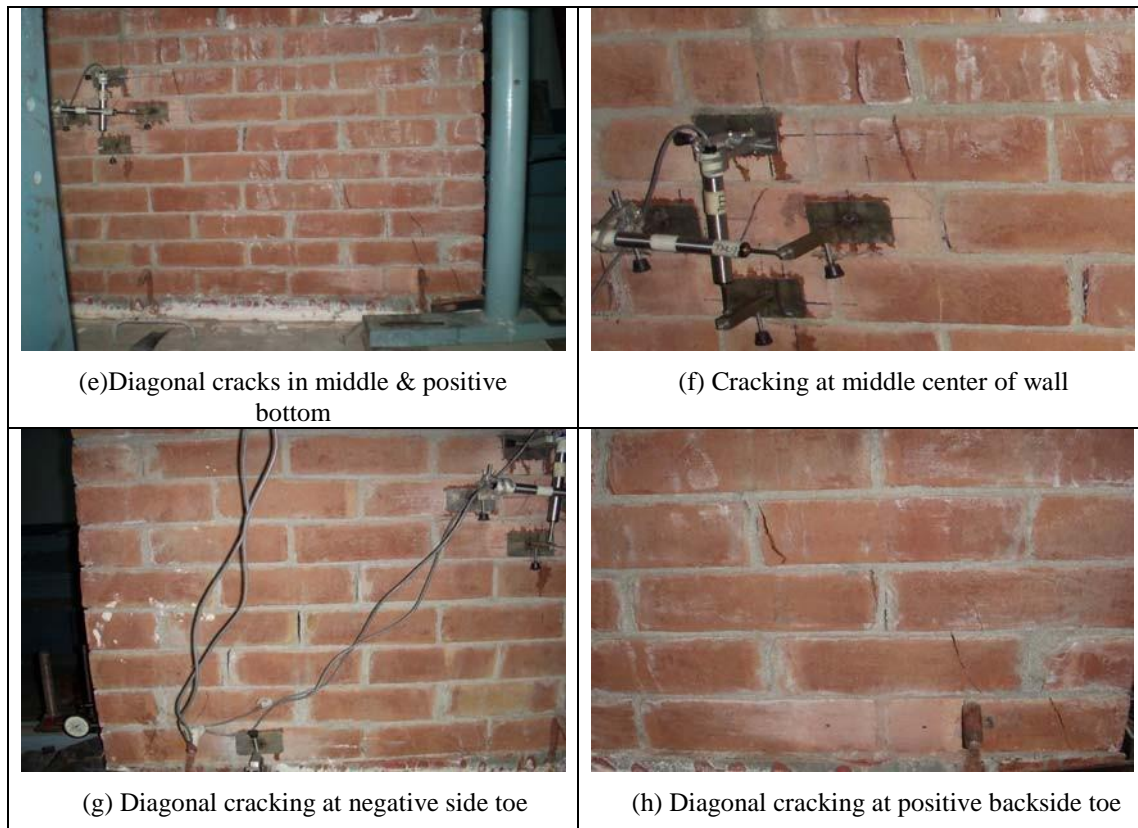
Pictorial view of failure of Masonry wall panel at different locations
